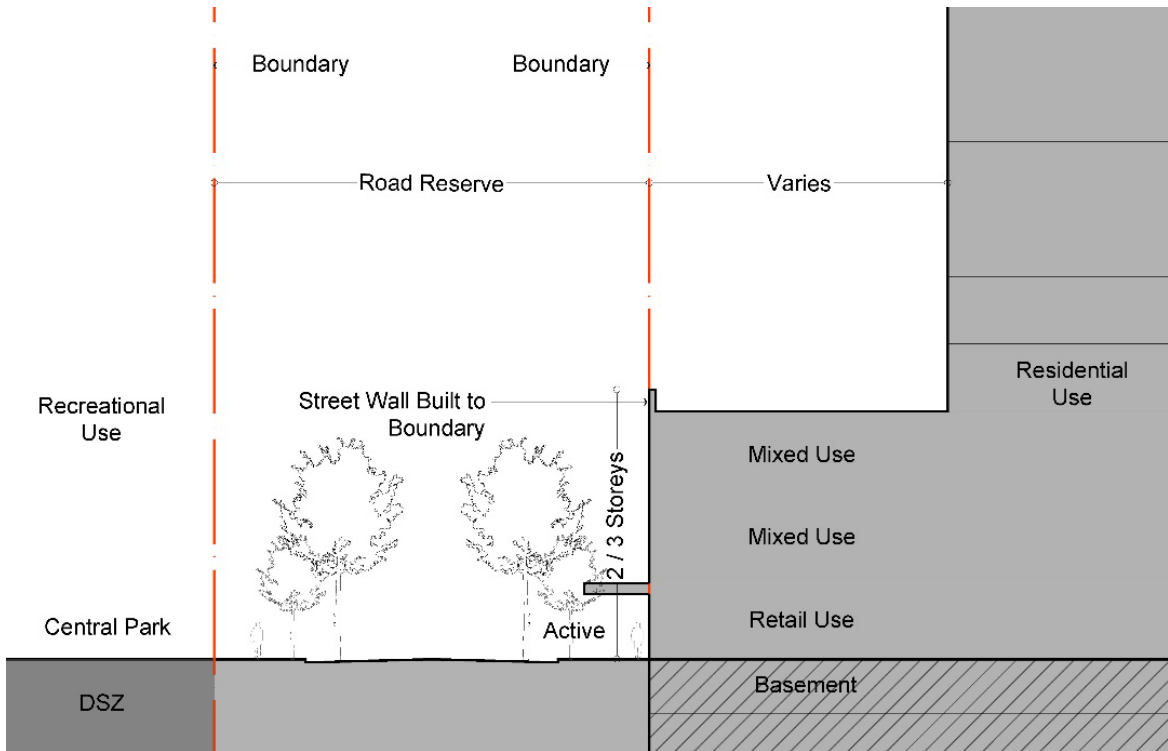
Street Wall Heights at Key Intersection
